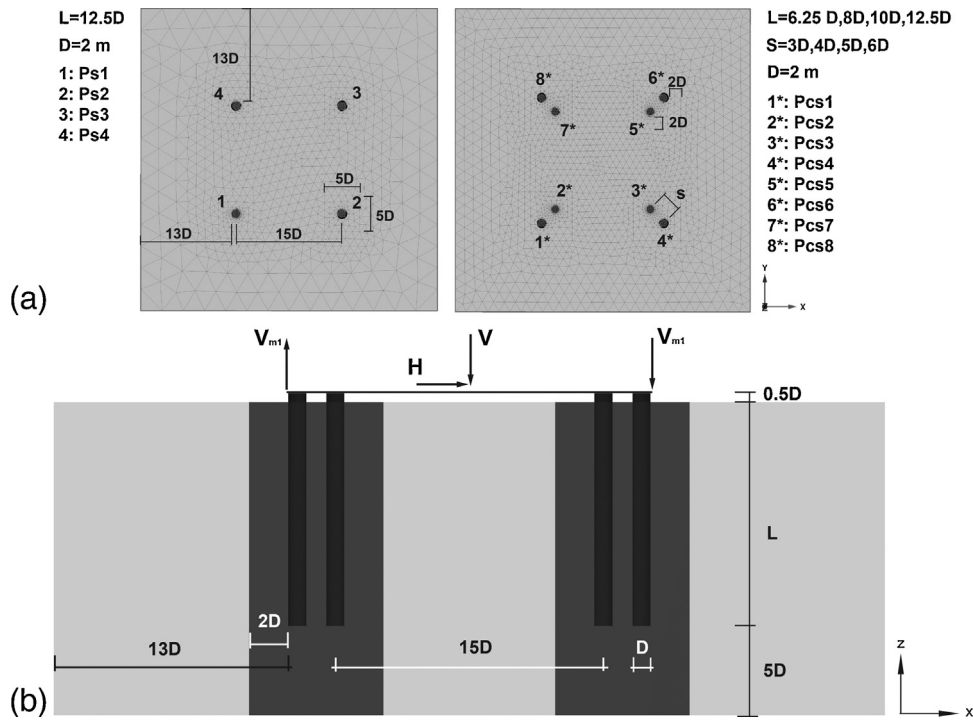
Finite element model plan view, geometrical properties, and loading of foundation system: (a) Plan views of single-pile and closely spaced double-pile configurations; (b) Cross-section of closely spaced double-pile configurations.
